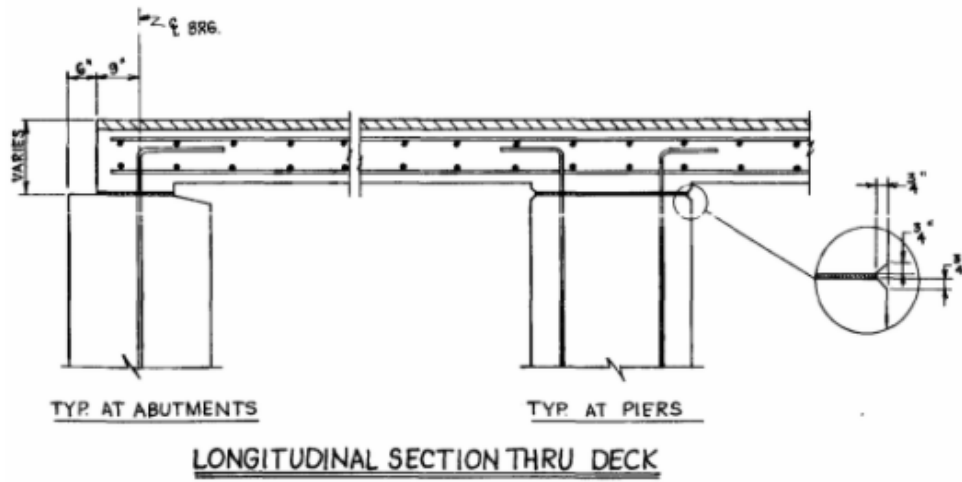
Longitudinal section of Bridge 27926 showing top and bottom reinforcement reprinted from MnDOT (1980).
